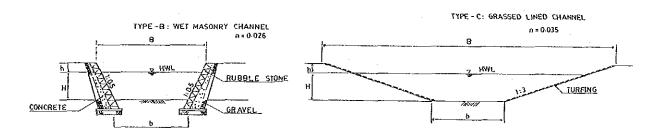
TYPICAL CROSS SECTION OF TRUNK DRAIN
